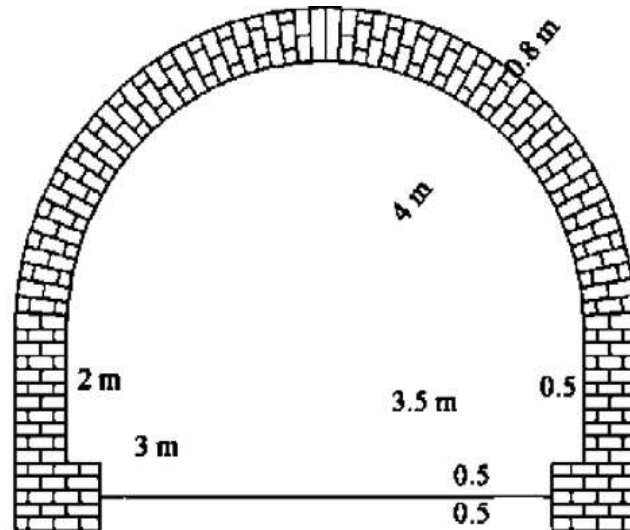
A typical vaulted masonry tunnel (Idris et al., 2008)
